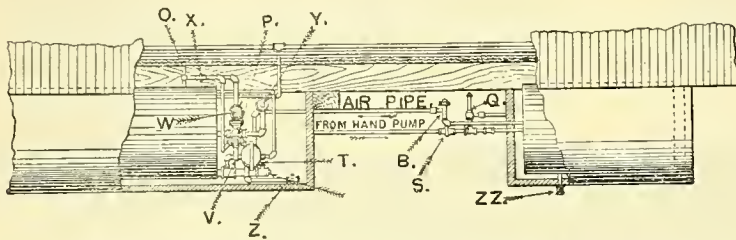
Part Sectional Elevation, showing Piping and Connections between Air-tank and Water-tank.
